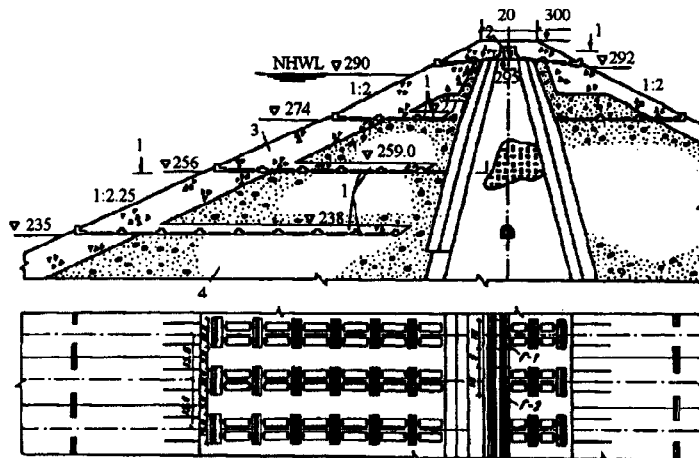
Cross-section of the Nurek dam: 1 - antiseismic belts; 2 - sighting gallery for measurements; 3 - stone additional load of upper slope; 4 - support prism made of gravel soil
